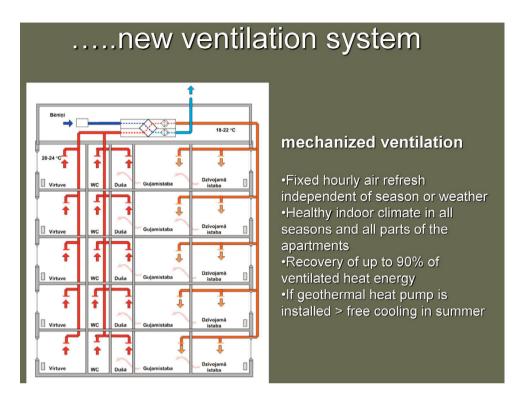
| New ventilation system in renovated building (credit: www.renesco.lv).
